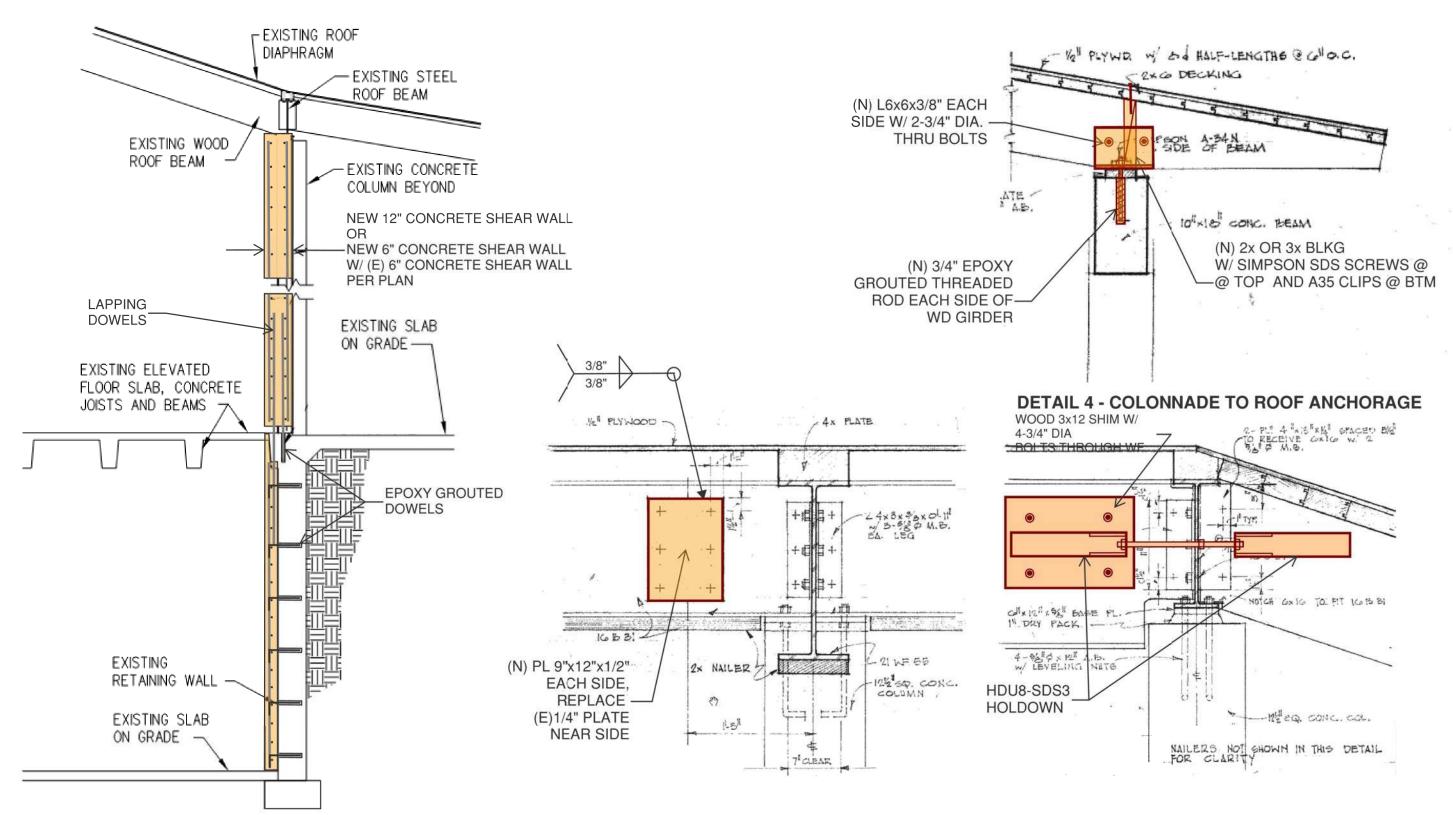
F: ELEVATION: EXISTING STEEL BEAM AT COLUMN AND SHEAR WALL
